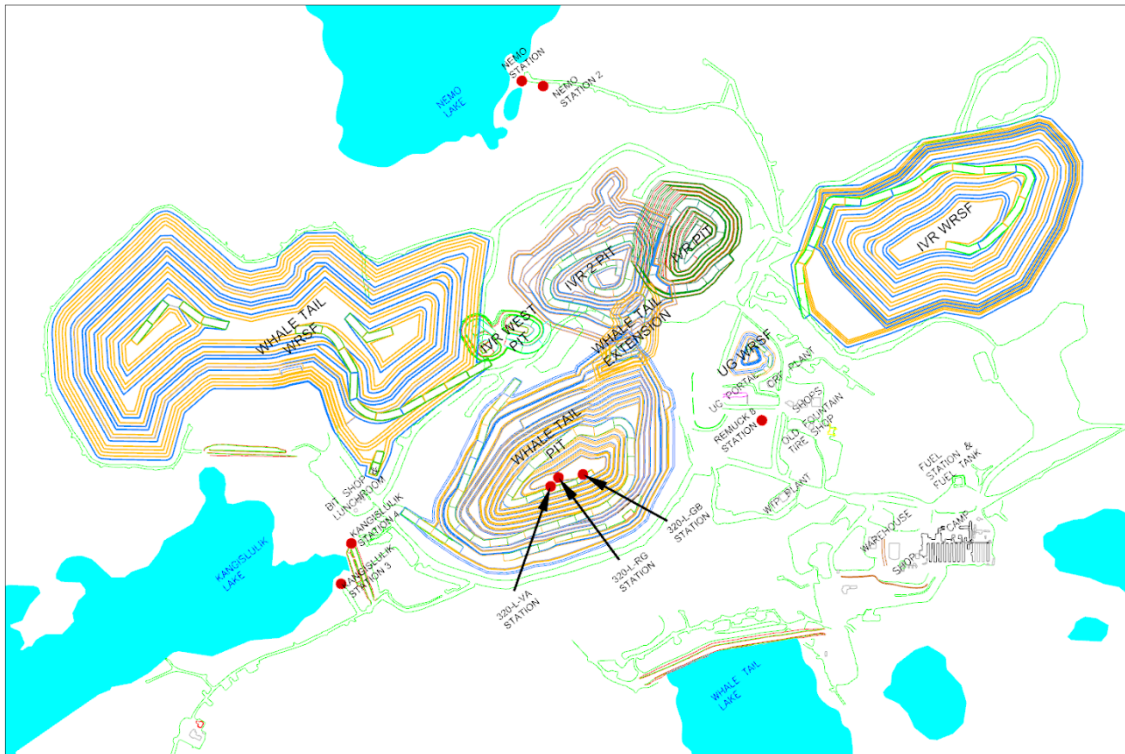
Whale Tail Mine Site Blast Monitoring Stations
